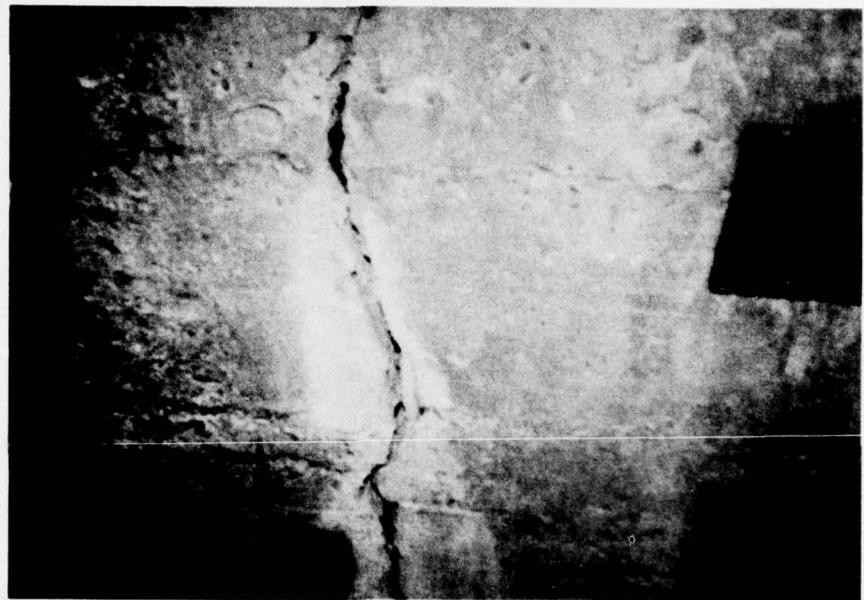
Cracking in the shaft which allows entrance to the dam tunnel.
